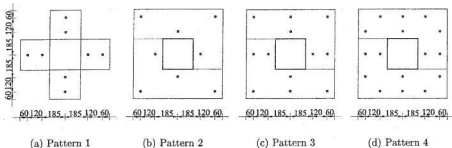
Steel plates and bolts configuration (dimension are in mm)
